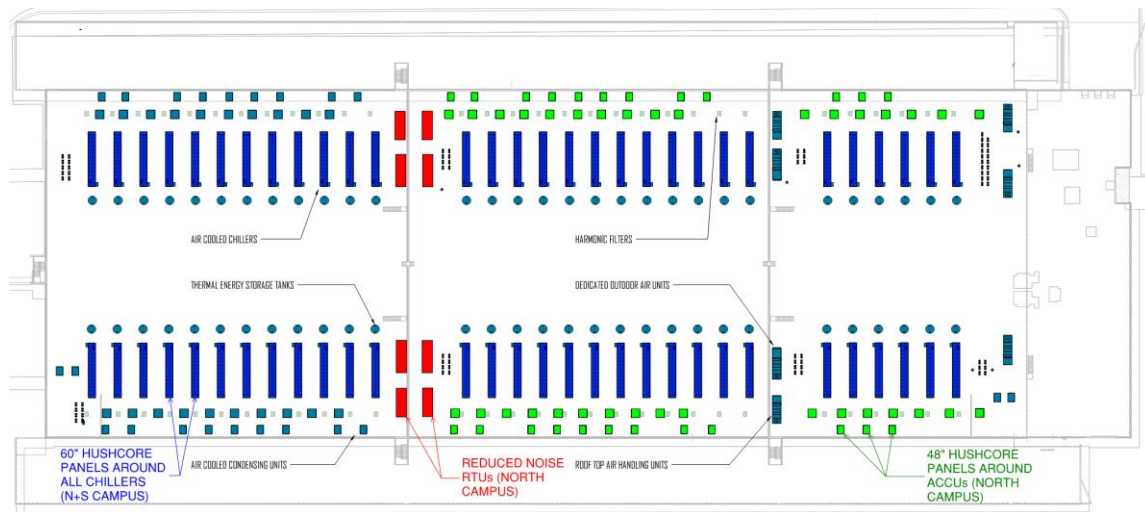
Rooftop Mechanical Noise Mitigation Plan (Typ of both North Campus Buildings)
